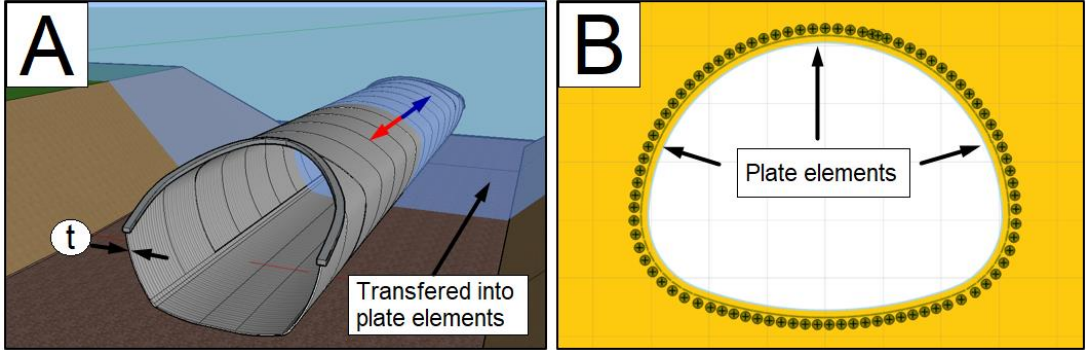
Principle sketch of transforming the steel plates of a flexible steel culverts into plane-strain, showing A) the section which intersects the structure and B) the transformed structure with plate elements
